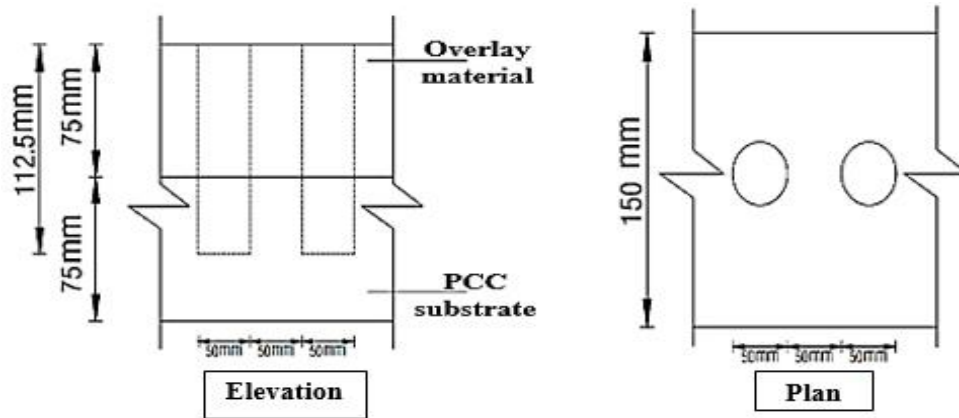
Dimensions of cylindrical specimens used for slant shear test
